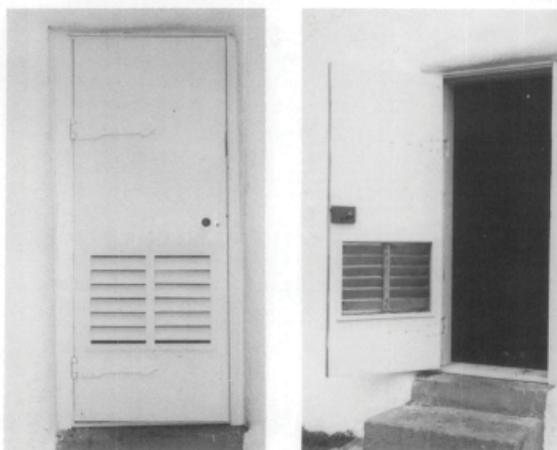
If historic doors would be damaged by adding extra locks, they should be removed and stored and new security doors added. At this lighthouse, the historic door has been replaced with a new door (seen both inside and outside) with an inset vent and new deadbolt locks. The heavy historic hinges have not been damaged. Photo: Williamsport Preservation Training Center, NPS.
